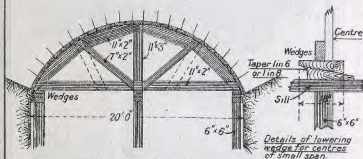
Showing scantlings and arrangement of centres for a bridge of 20 feet span.
